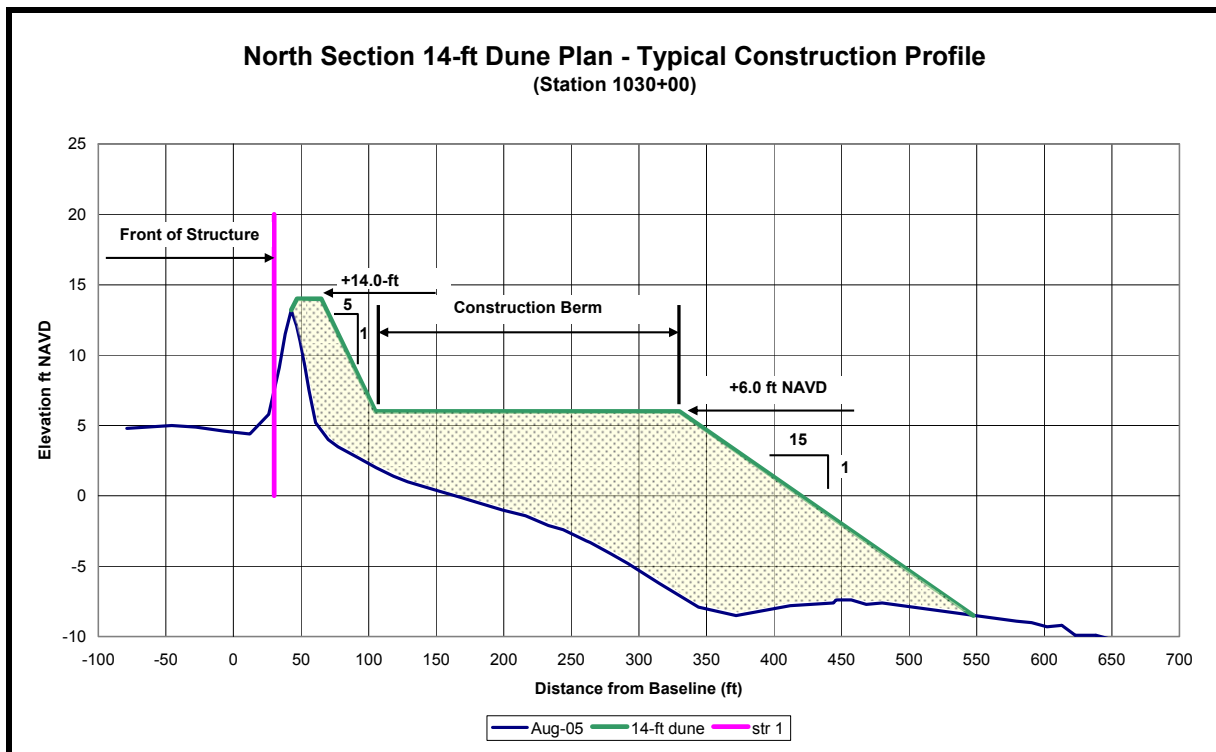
Typical construction profile, North Section 14-foot Dune Plan (Station 1030+00).
